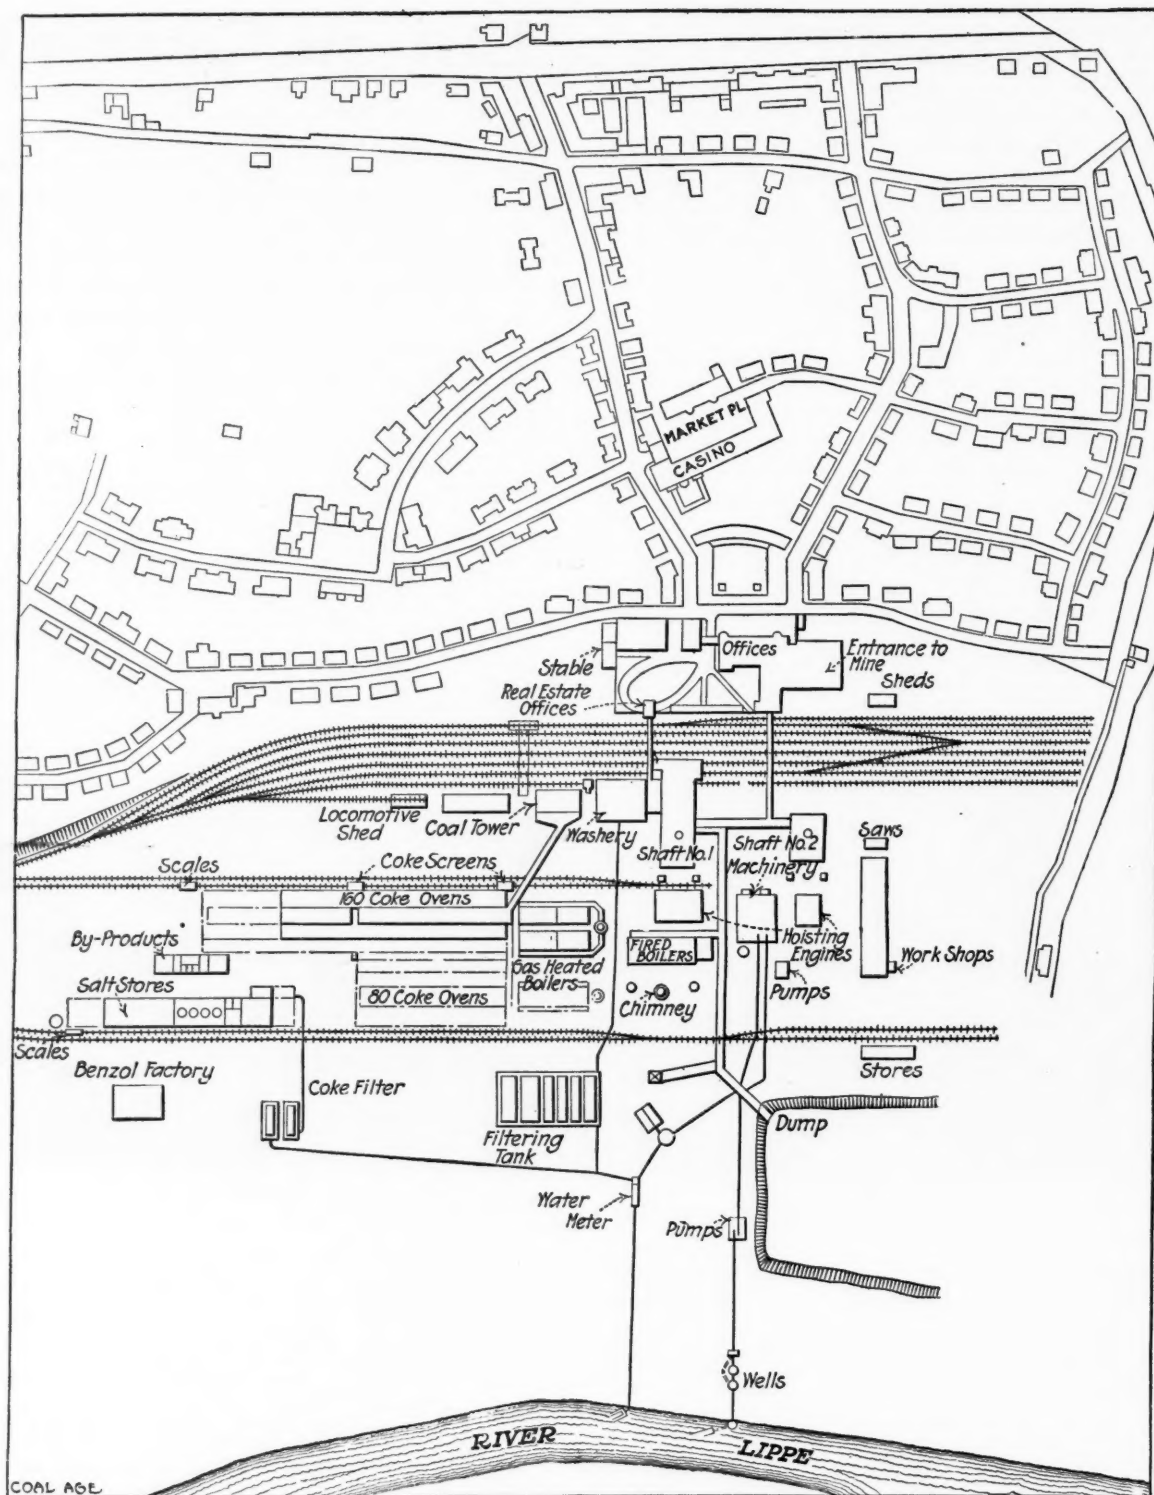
LAYOUT OF COLLIERY PLANT AND WORKMEN'S VILLAGE
